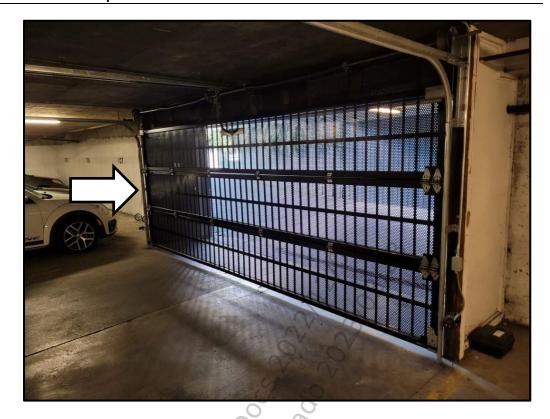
(B20 30 02.05) - Overhead Parkade Gate
